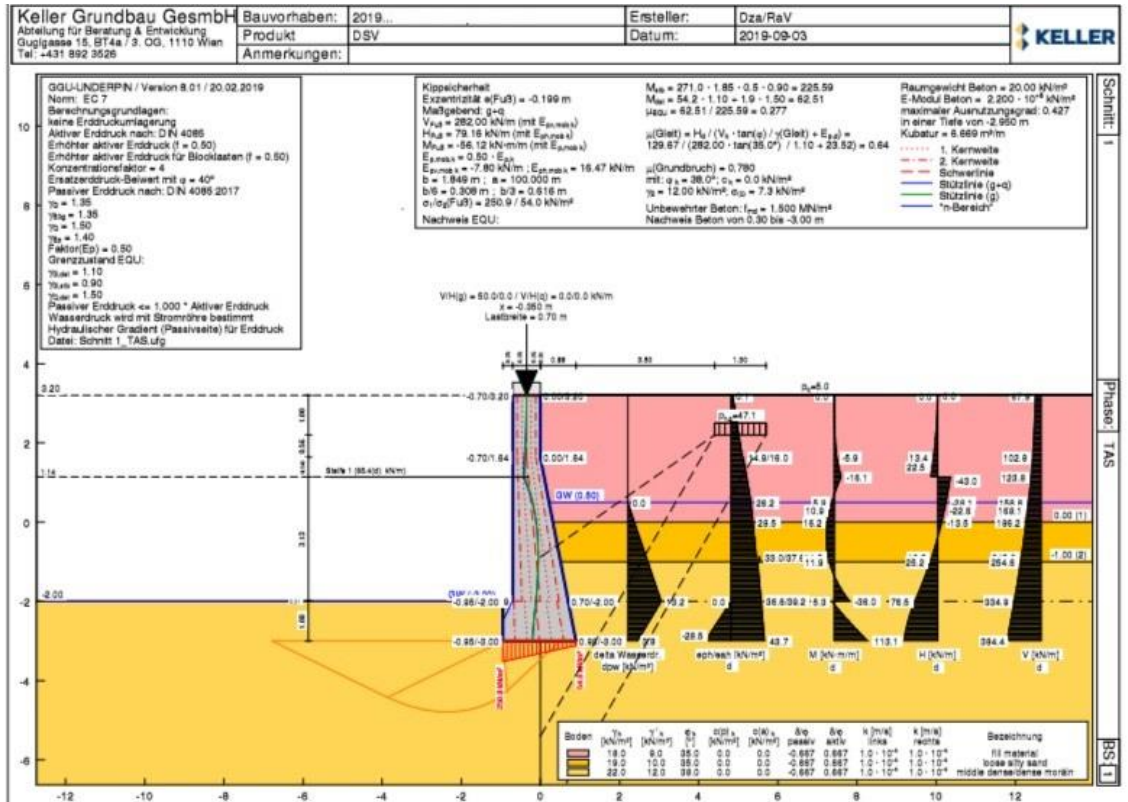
Jet grouting wall under the building (Virolainen, 2019)
